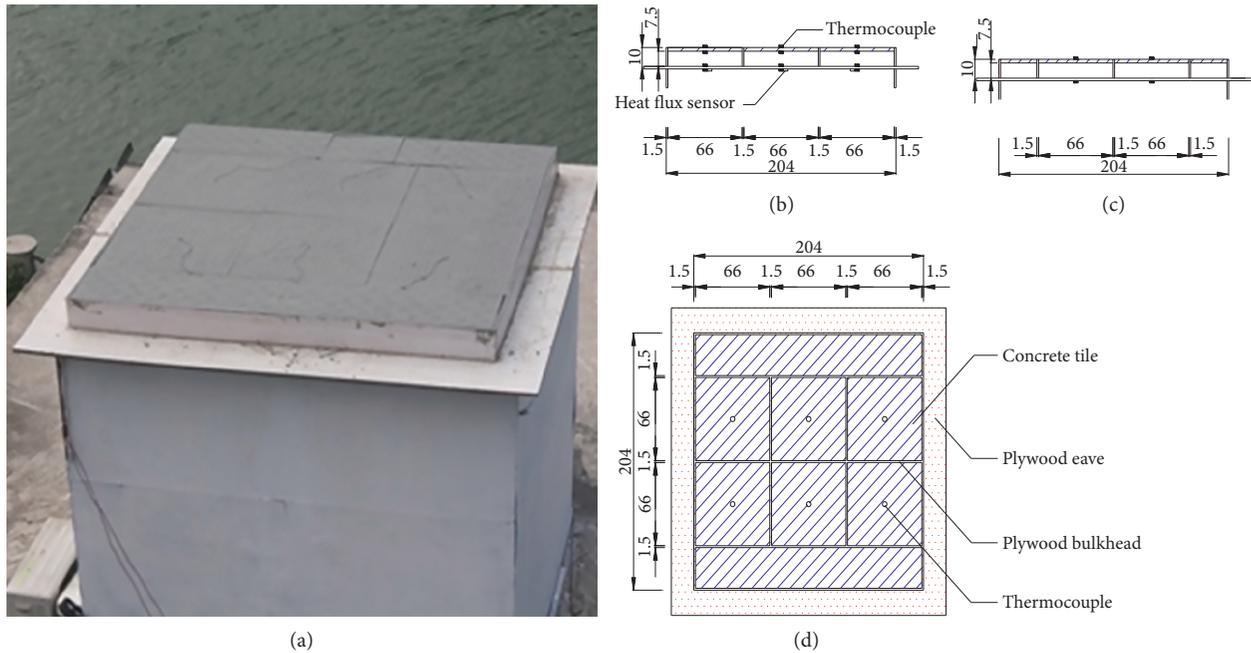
The experimental building cell and the deployment of measurement sensors on the concrete roof tile. (a) A photo of the roof, (b) roof's front view, (c) roof's side view, and (d) roof's plan view.
